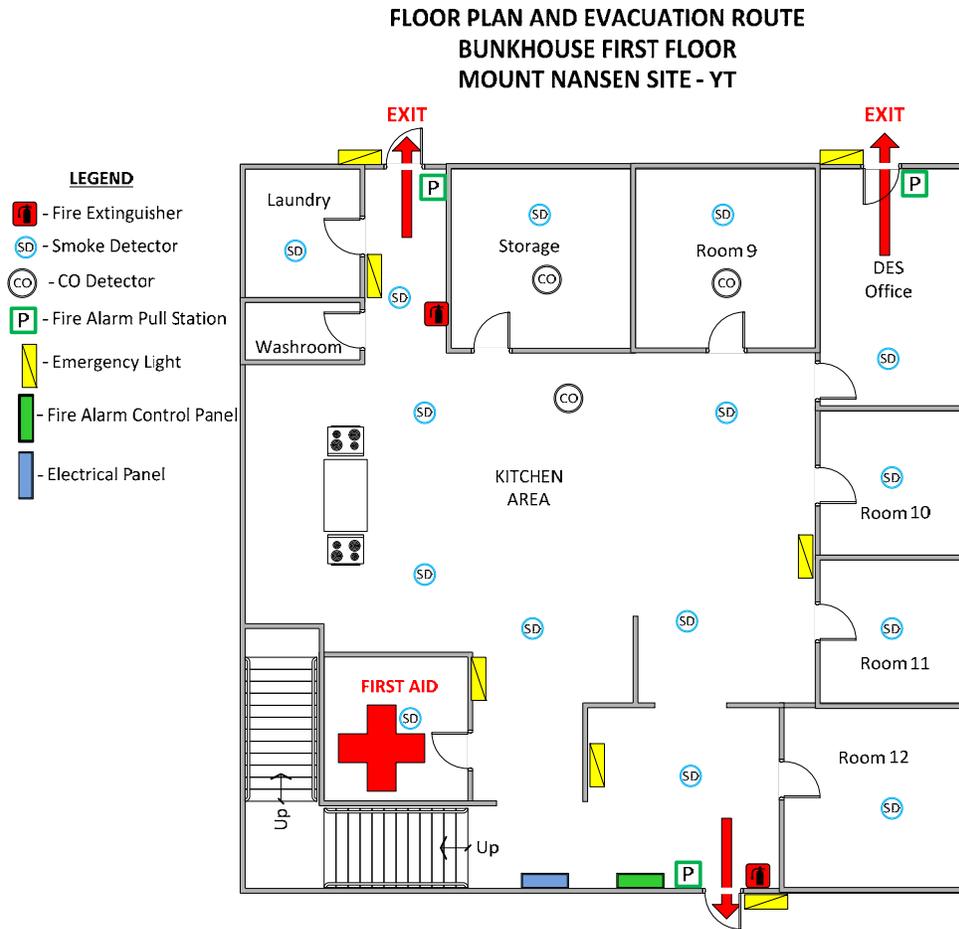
Bunkhouse First Floor Plan and Evacuation Routes
